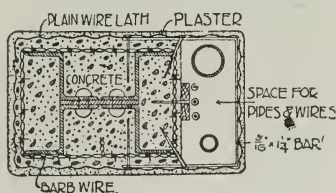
Concrete Covering for Column. Hinchman-Renton System.
